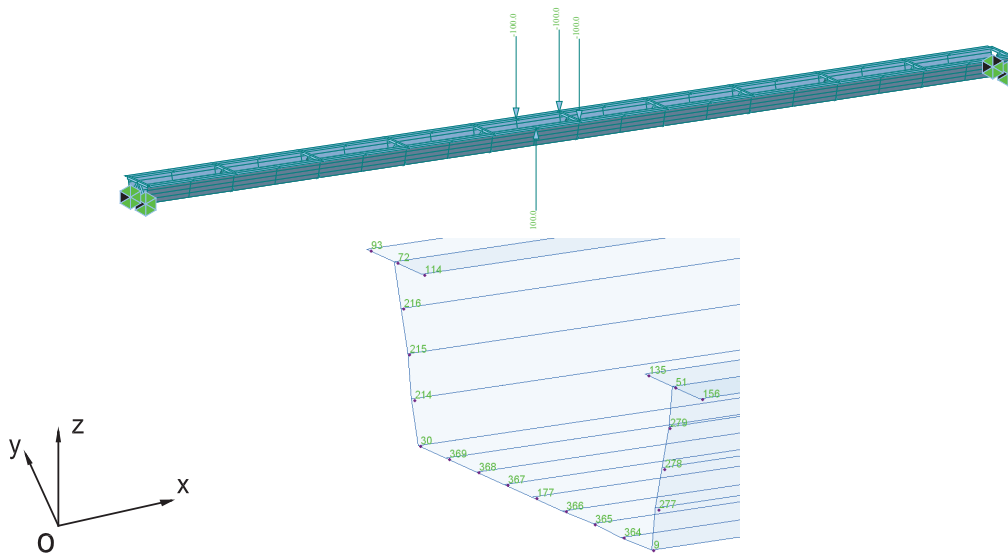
Modeling the box girder segment and the nodes on the cross-section
